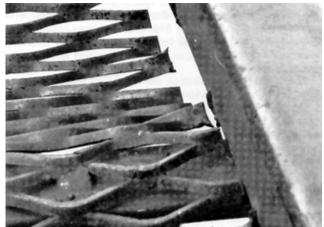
Failure of Welds on Loading Ramp Grating.
